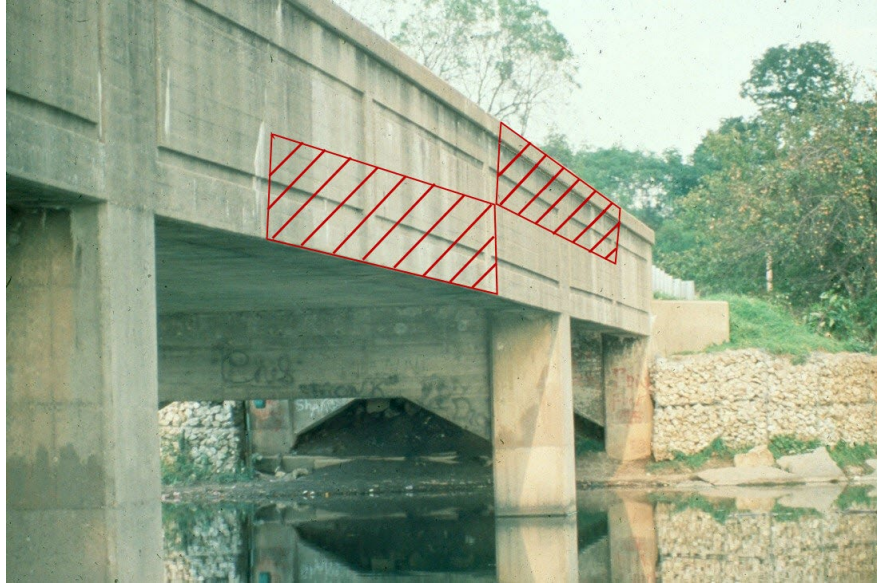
Through Two-Girder Bridge Elevation with Tension Zones Indicated
